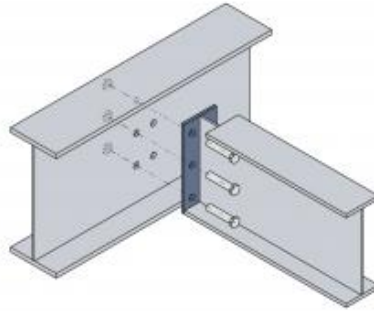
Connection with the top flange of the incoming beam notched.
